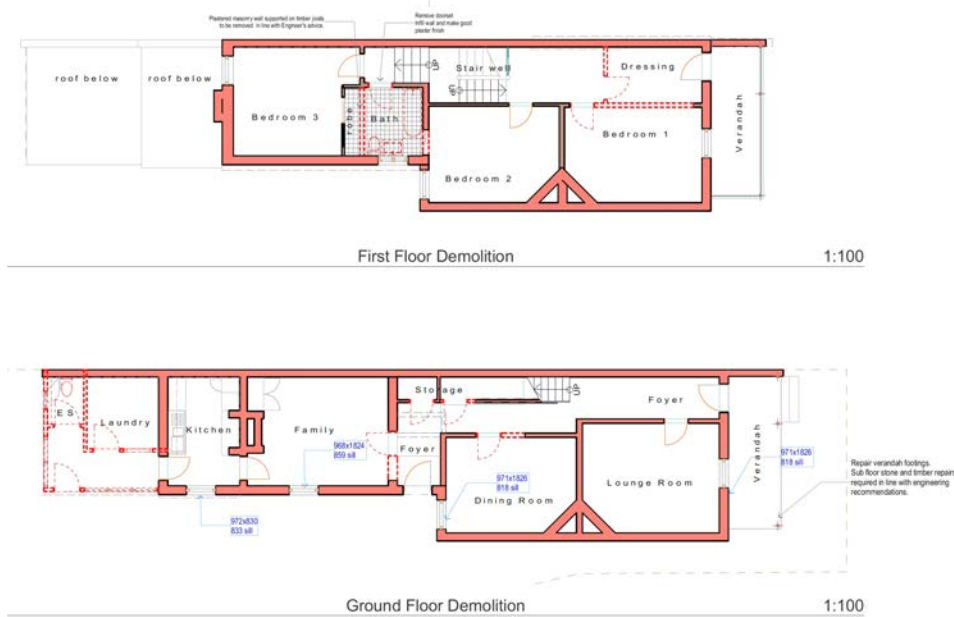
Floor Plan of the proposed demolition works (Shown in broken red lines)
